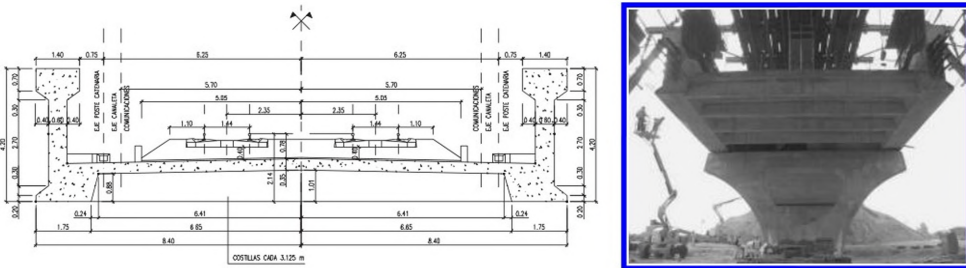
Typical bridge cross-section for a HSRL viaduct with a main span of 50 m.
